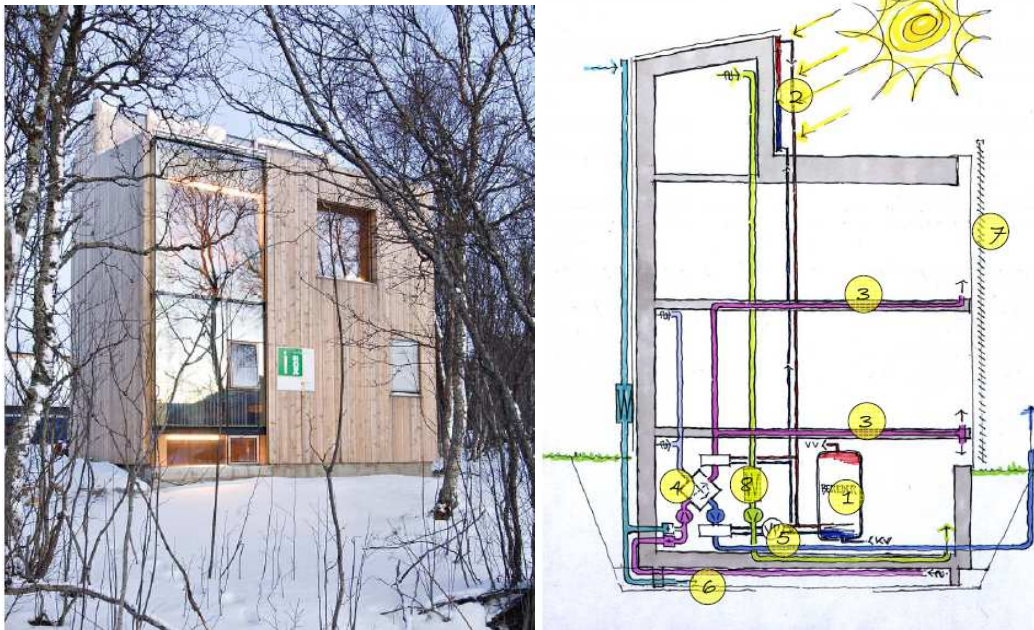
The I-box one-family house (left) and system layout (right) Photo and illustration: Steinsvik Architects.
